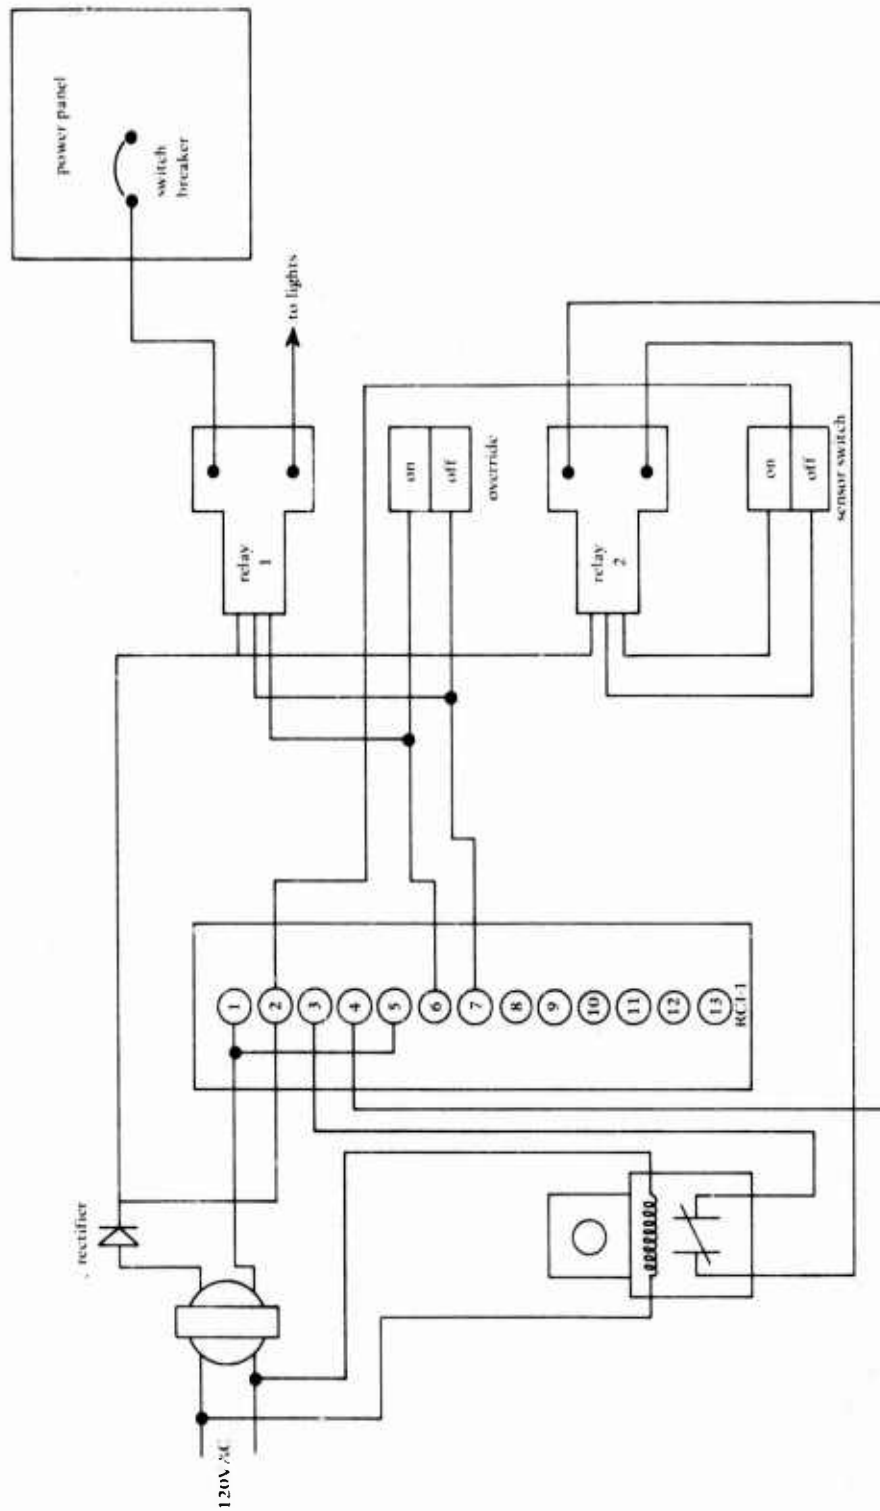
Wiring diagram of GE light sensing and control system for hallway in building 560.
